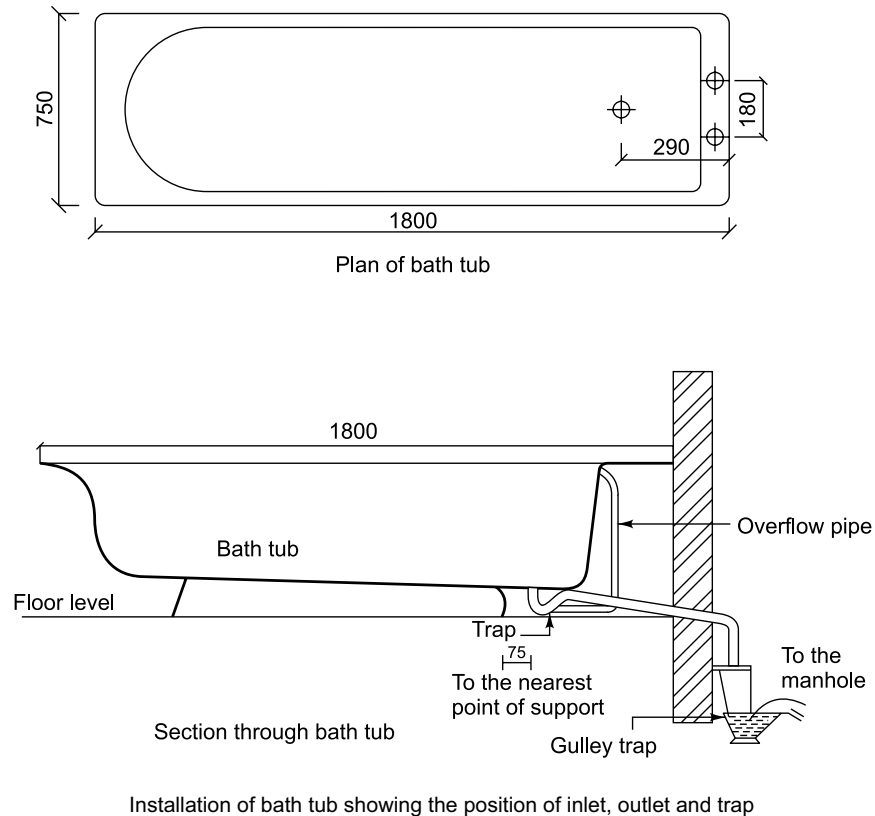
Installation of bath tub showing the position of inlet, outlet and trap
